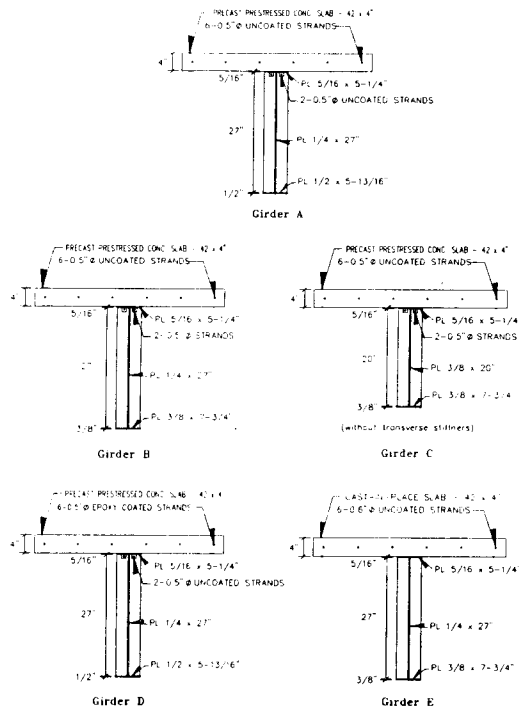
Cross-Sections of Girders at Midspan (1 in. = 25.4 mm; 1 ft = 304.8 mm)
